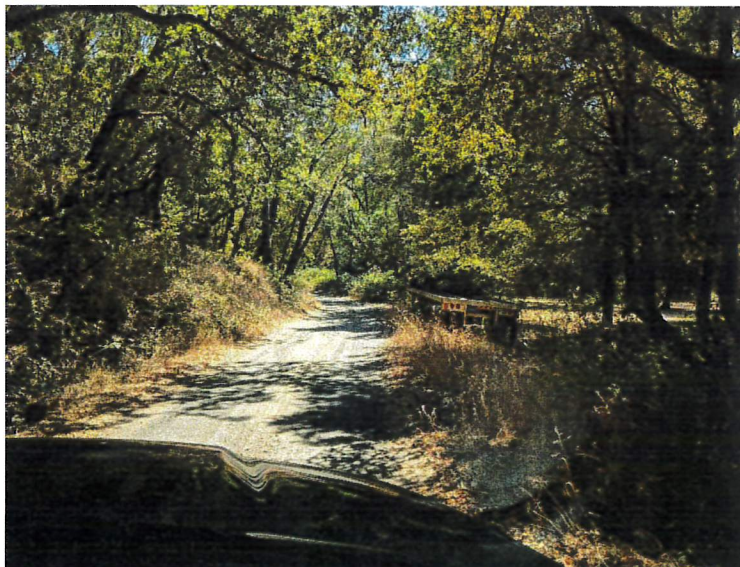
Widened shoulder / parking area STA:16+35FT sufficient to park a semi trailer and allow vehicles to pass
